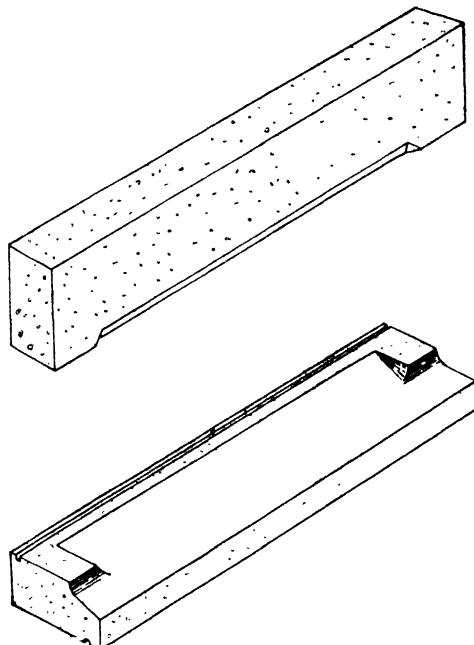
CONCRETE WINDOW SILL AND HEAD
